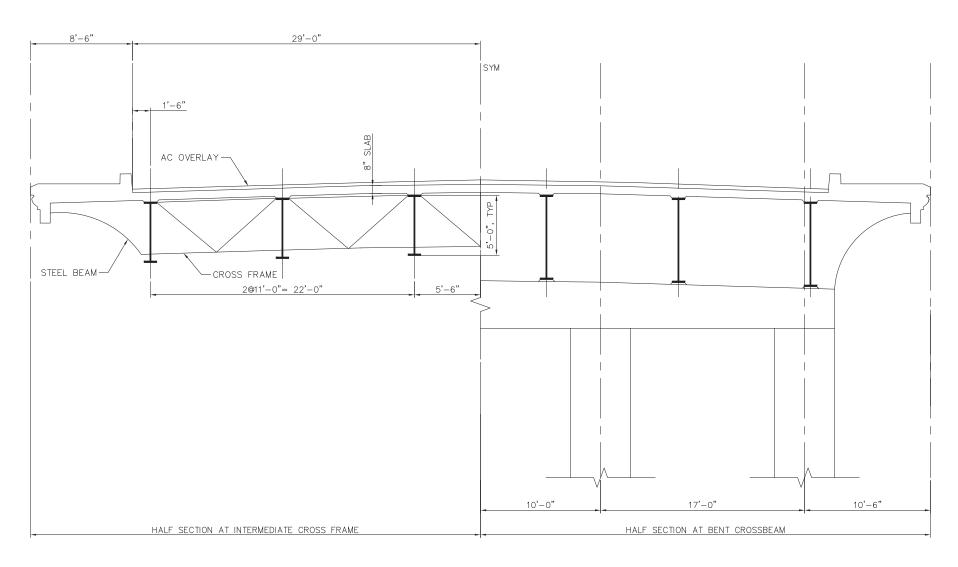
STEEL I-GIRDER DECK SECTION
